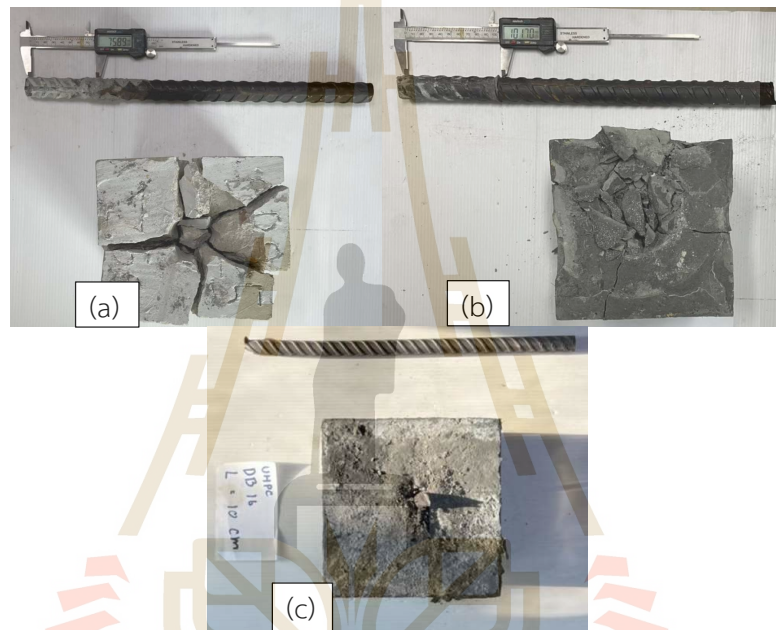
Failure modes of (a) Normal concrete, (b) UHPC with bond failure and (c) UHPC with steel bar rupture
